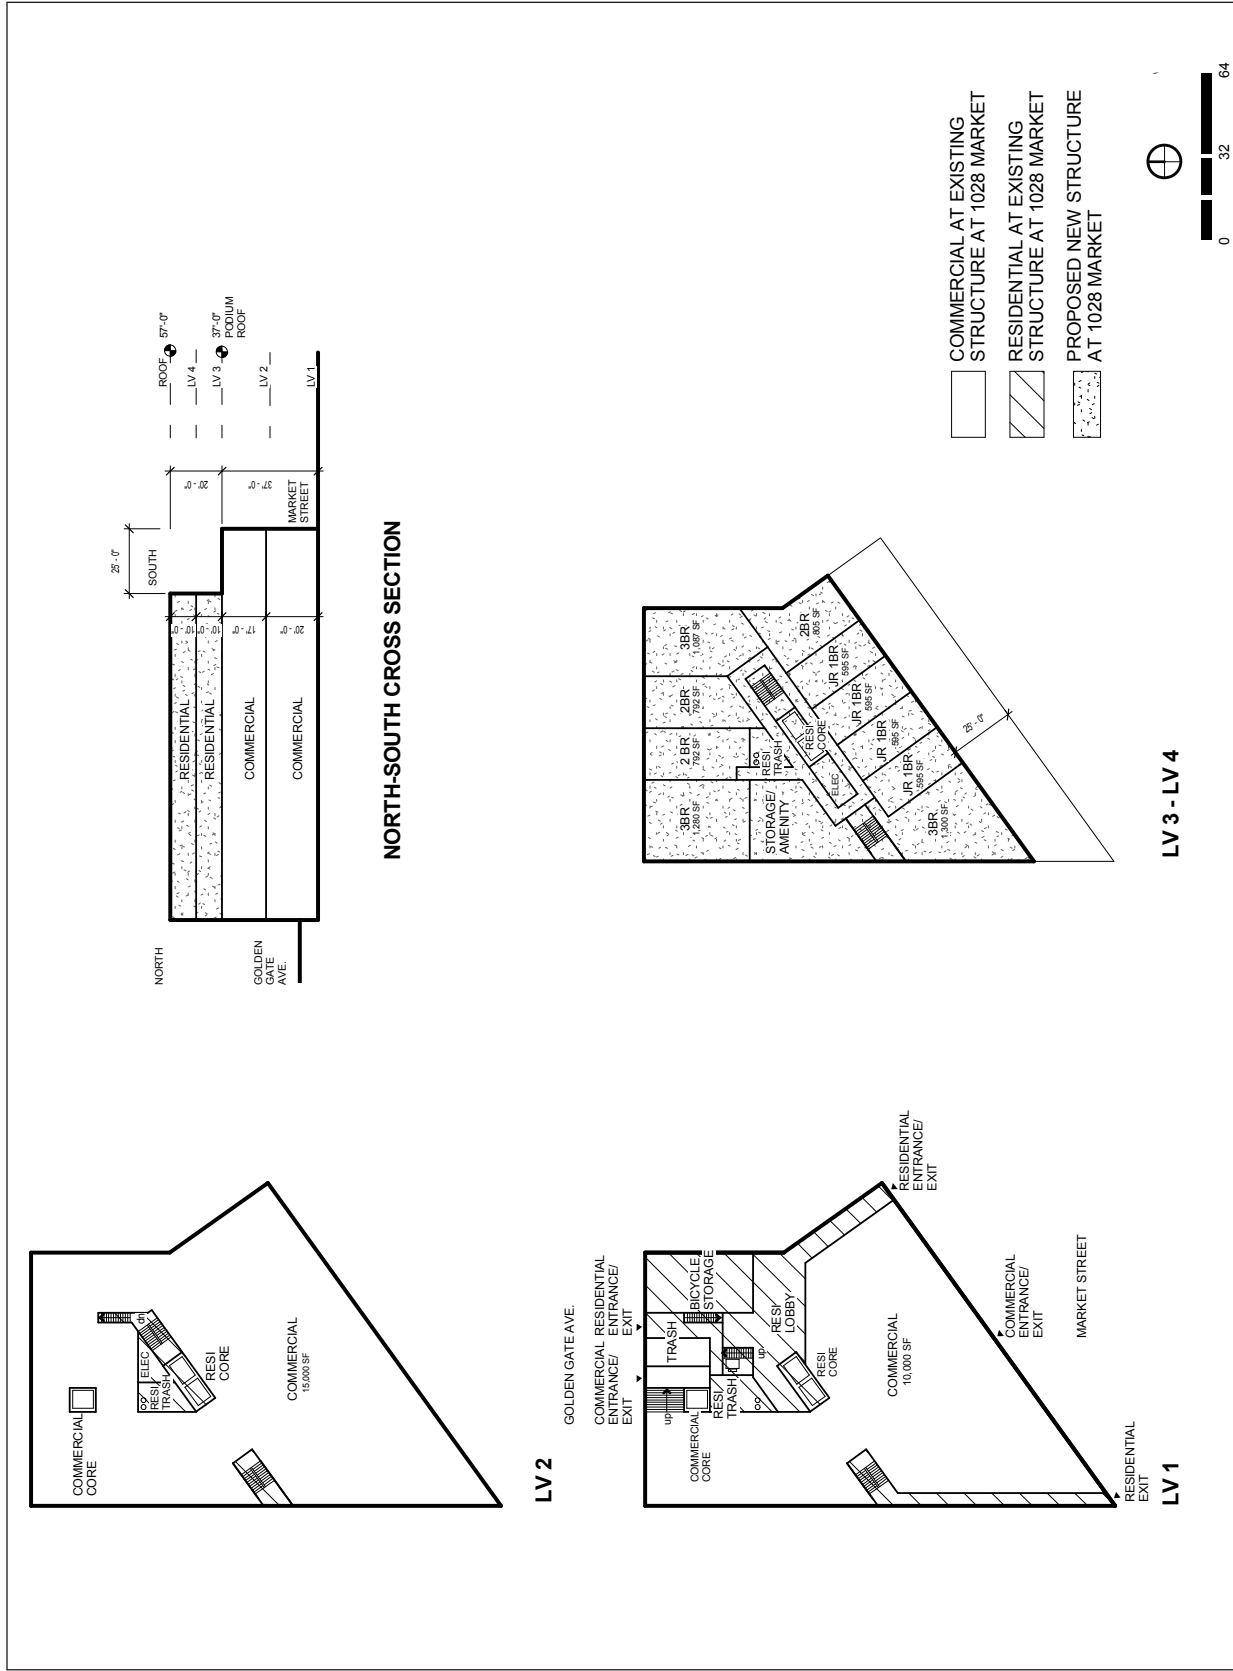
FULL PRESERVATION ALTERNATIVE – REPRESENTATIVE FLOOR PLANS AND CROSS SECTION
